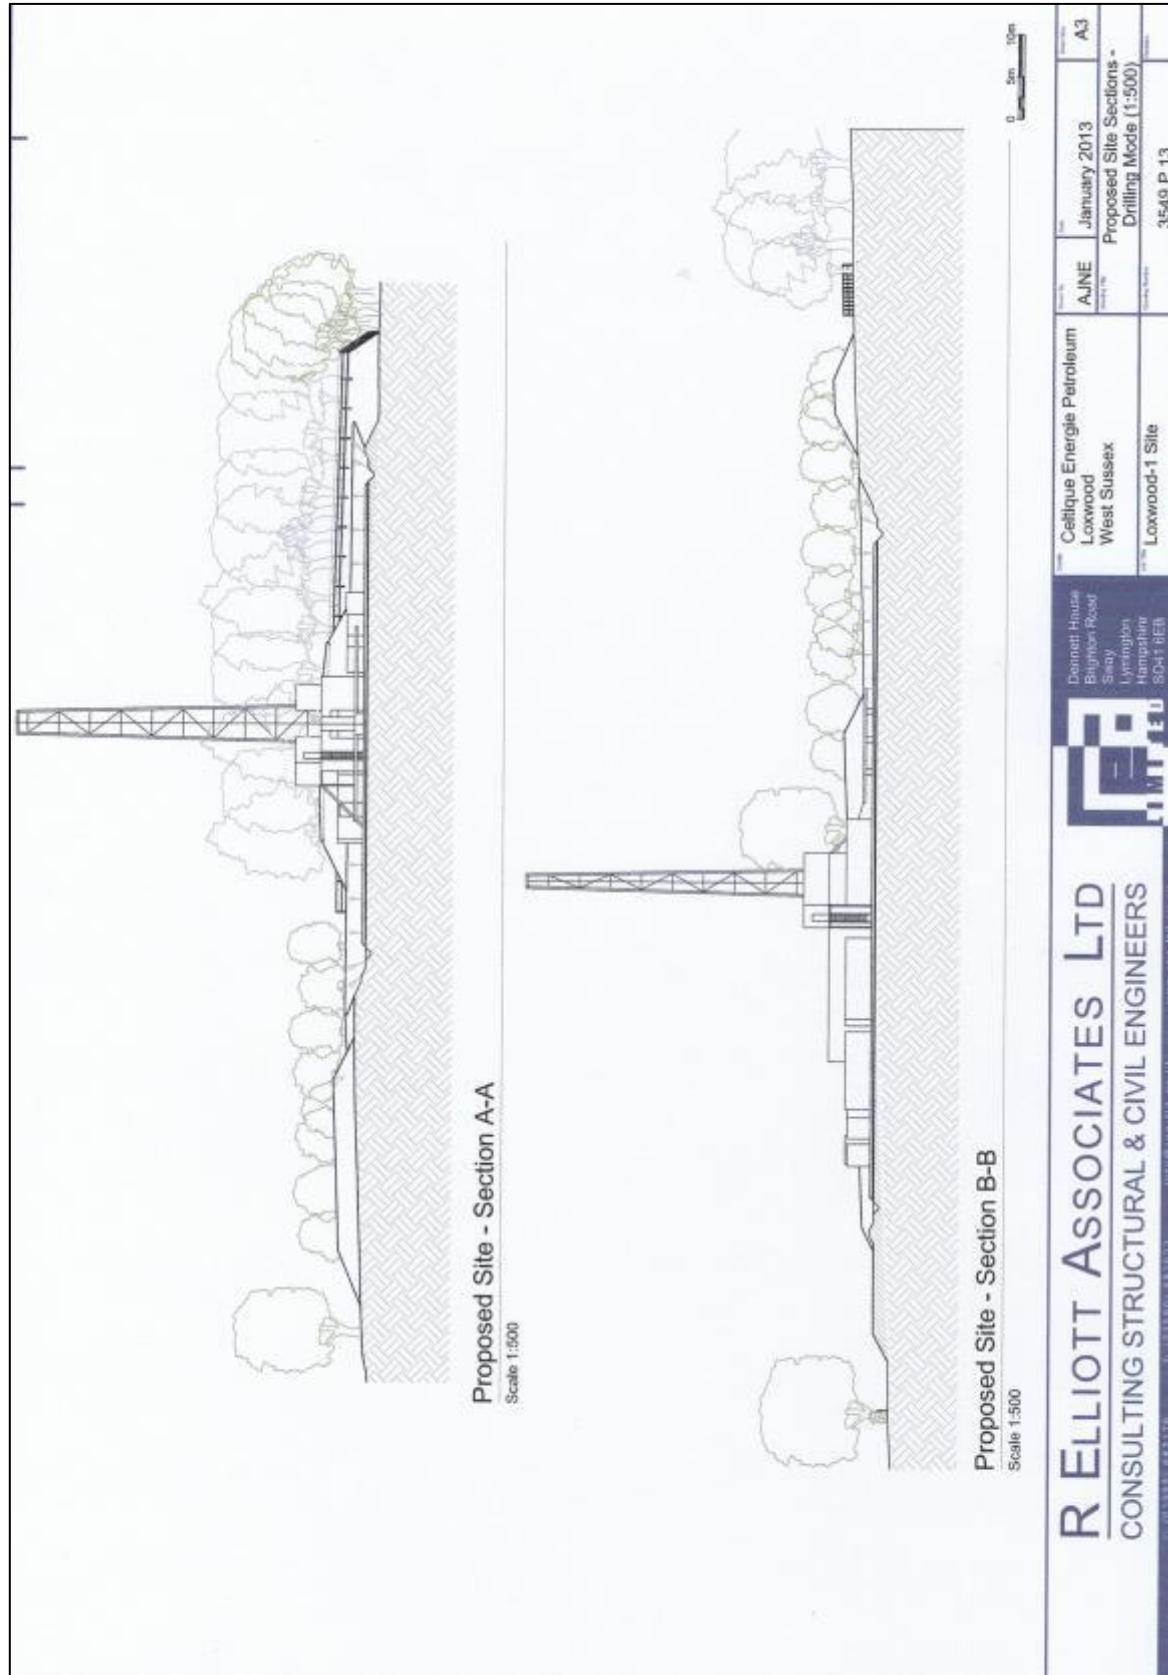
Land West of Barnfold Farm, Loxwood: Sections across proposed site
